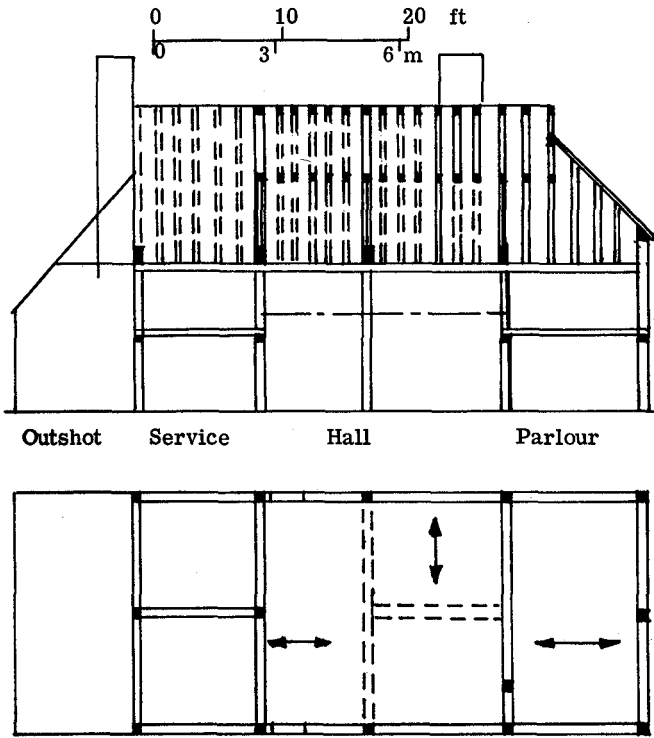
8 and 9 Littleton. Longitudinal section and plan
